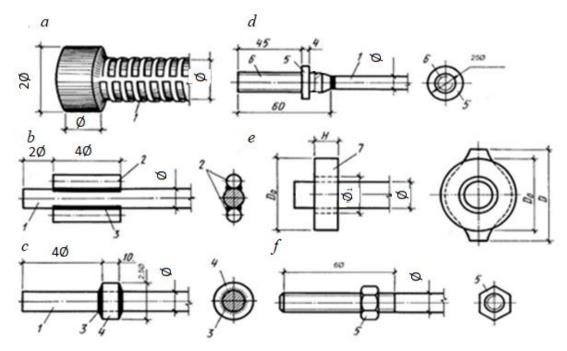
Technological anchor of bars of pre-stressed reinforcement: a – the blown head; b – the welding of short bars; c – welding ring; d – wrap nut; e – compressed gasket; f – wrap nut; 1 – reinforcing bars; 2 – short bars; 3 – welding; 4 – ring; 5 – nut; 6 – stamped steel tip with chasing, which is welded to the reinforcement; 7 – compressed gasket
